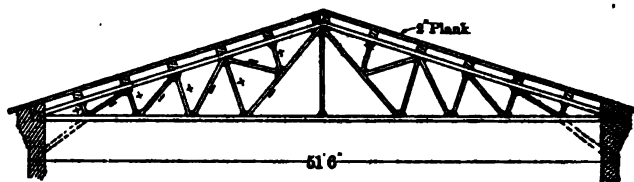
Fink Truss. Span Fifty-one Feet Six Inches
